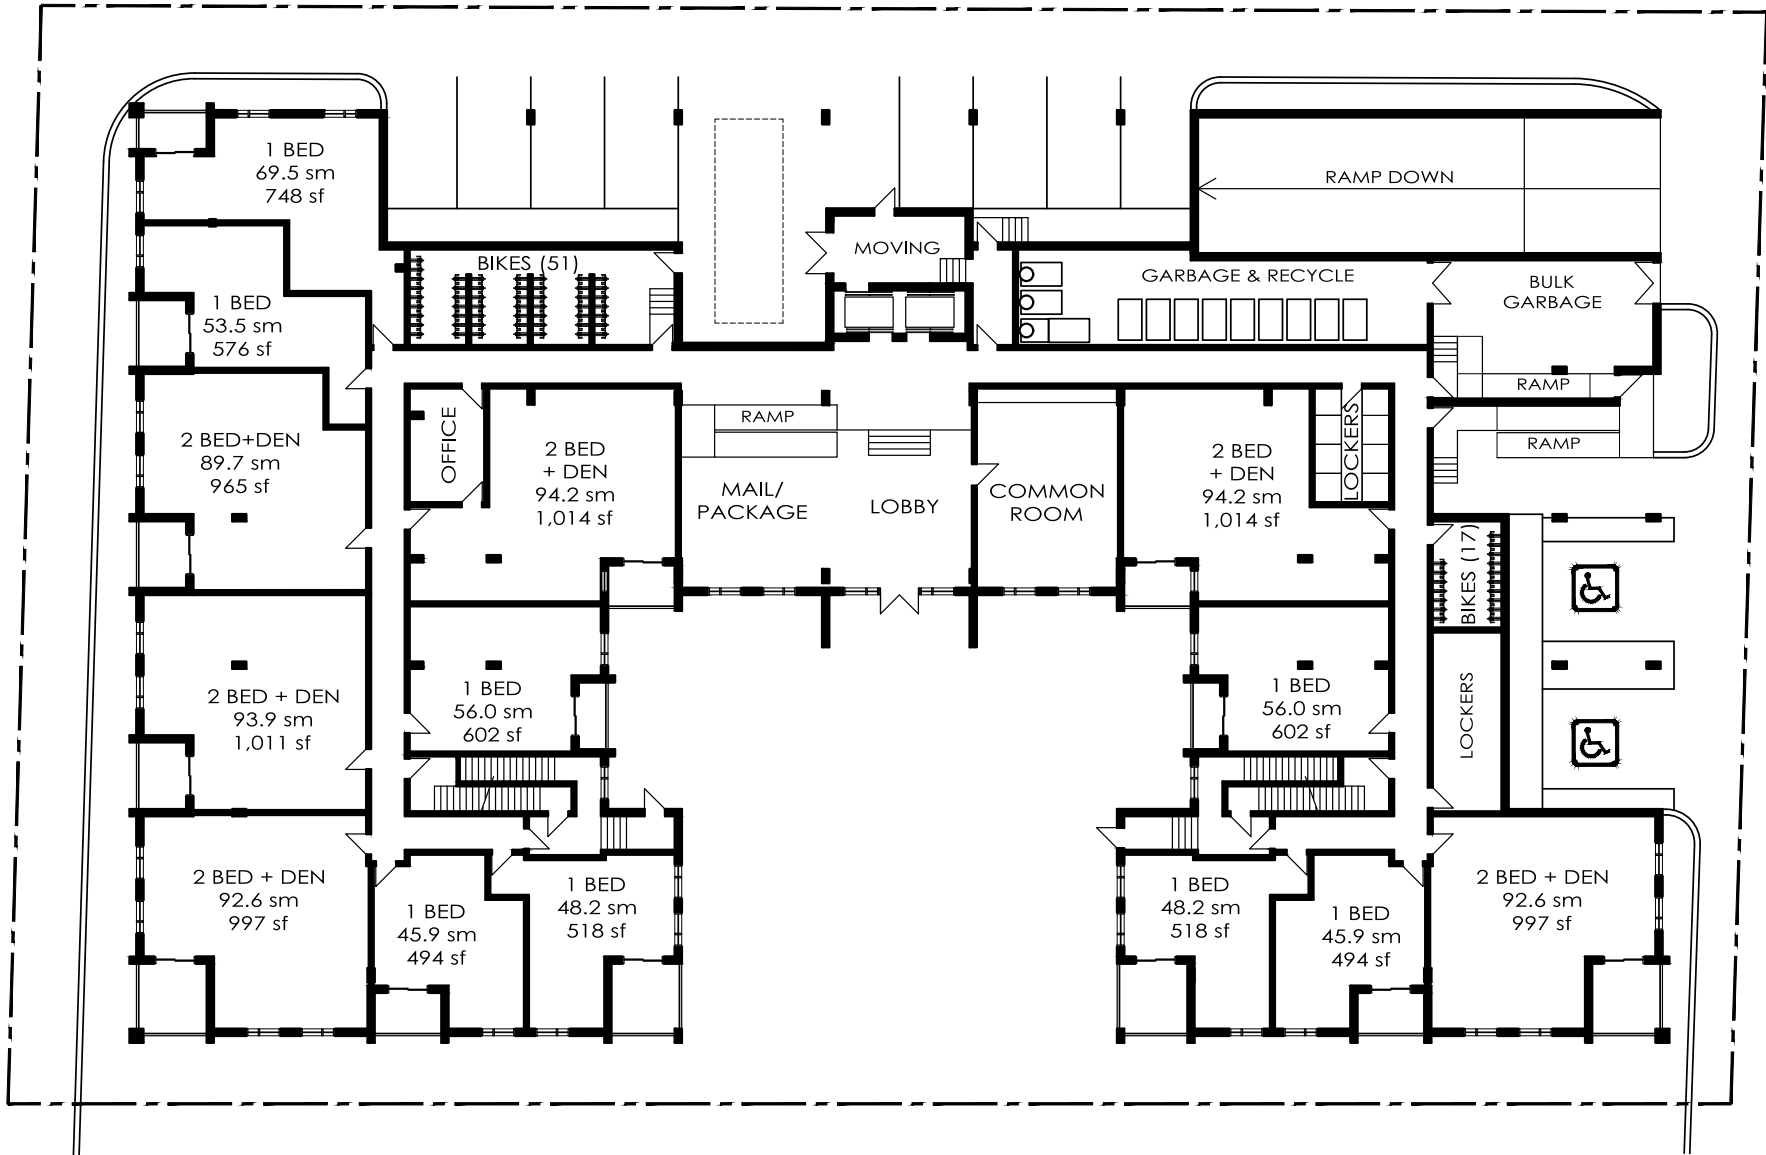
Ground Floor Plan prepared by Lintack Architects Inc.
